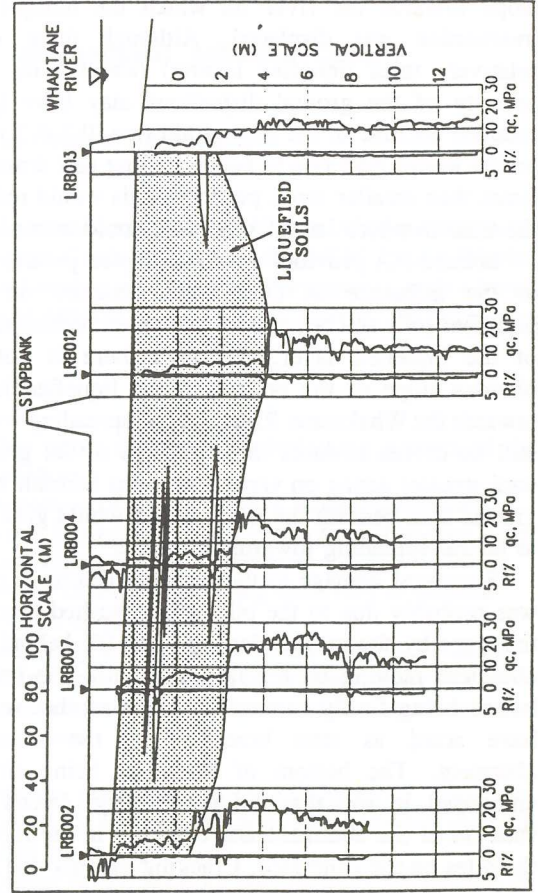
Section BB at Landing Road Bridge site showing CPT data and estimated liquefied soils.
